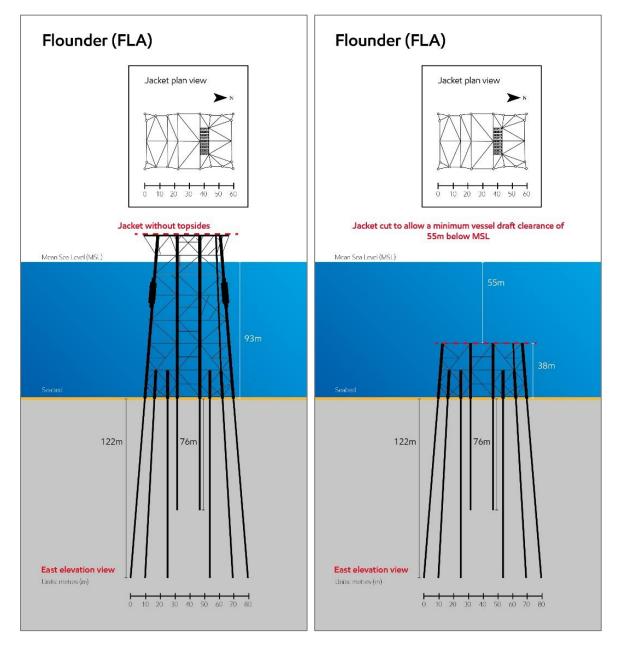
Flounder Steel Piled Jacket without topsides (left) and under proposed end state (right)
